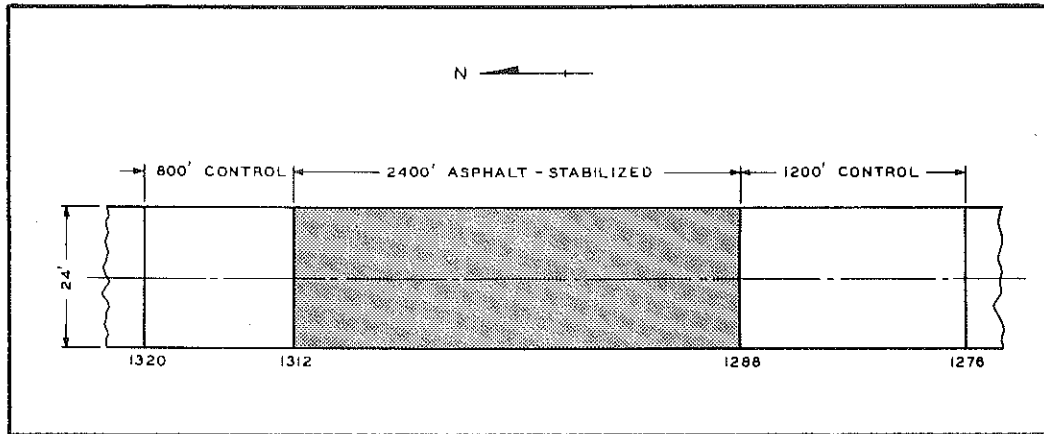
Layout of test area and control sections; southbound US131 2-1/2 miles south of Cadillac.
